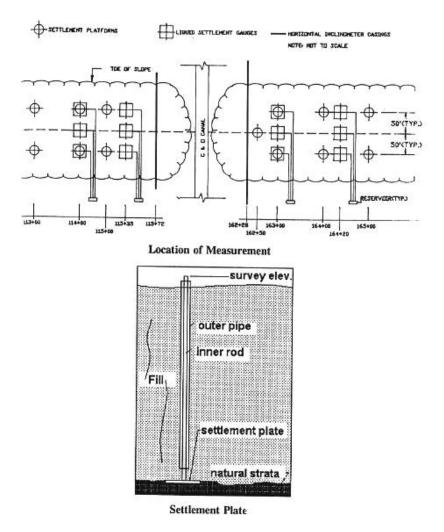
Chesapeake & Delaware Canal Bridge Instrumentation Layout, after Brylawski, et al., (1994).
